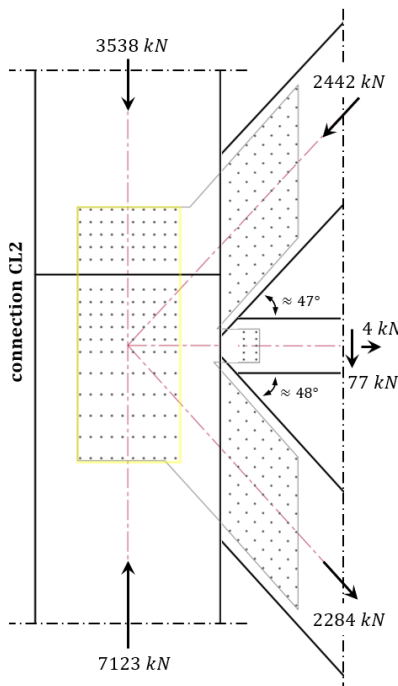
Truss connection CL2 between diagonals and corner column.
